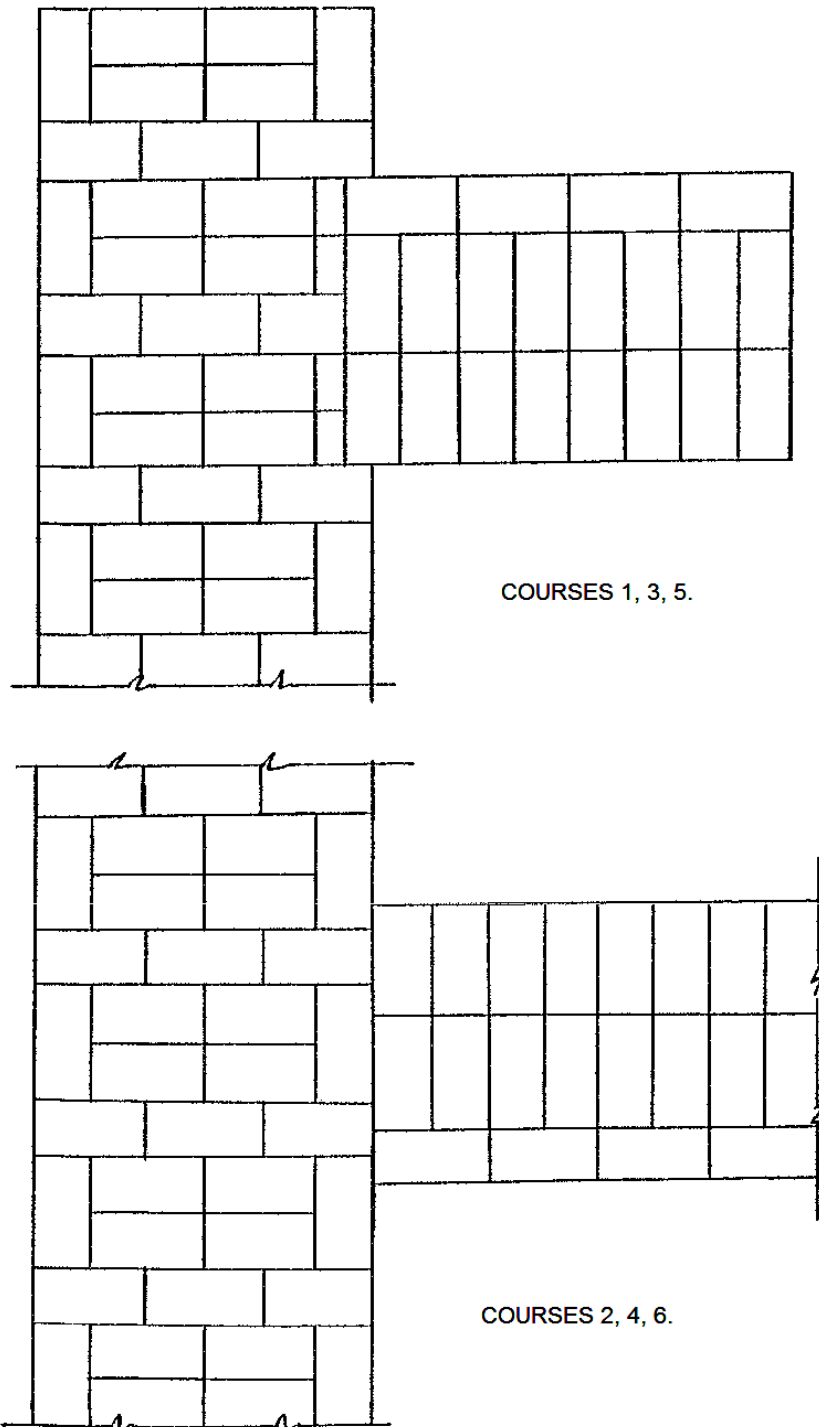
T-junction between a three-brick wall in Flemish bond, and two-and-a-half brick wall in English bond.
